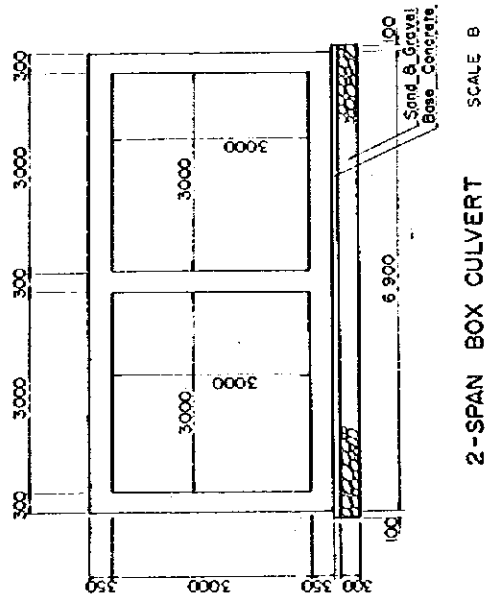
TYPICAL DRAINAGE STRUCTURE
